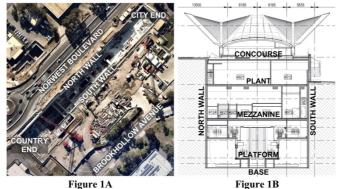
Aerial photo (Figure 1A). Typical station structure layout (Figure 1B)
